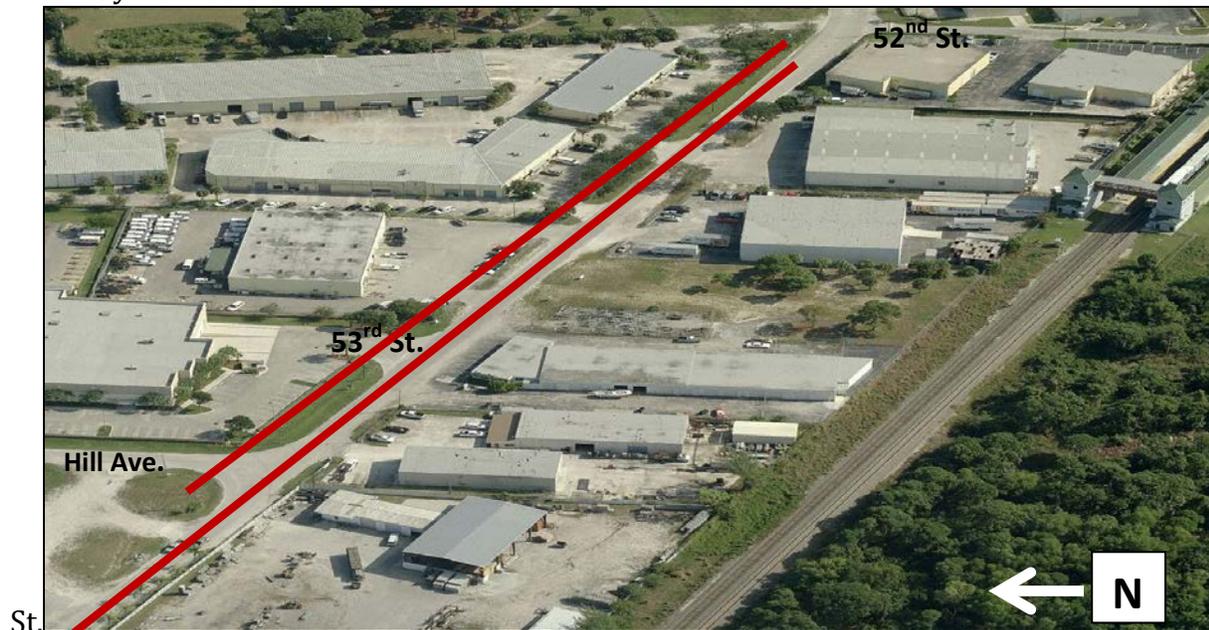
Industrial Area Sidewalks (MP7) – Construct sidewalks from 52nd St. to 53rd St. to Hill Avenue.
